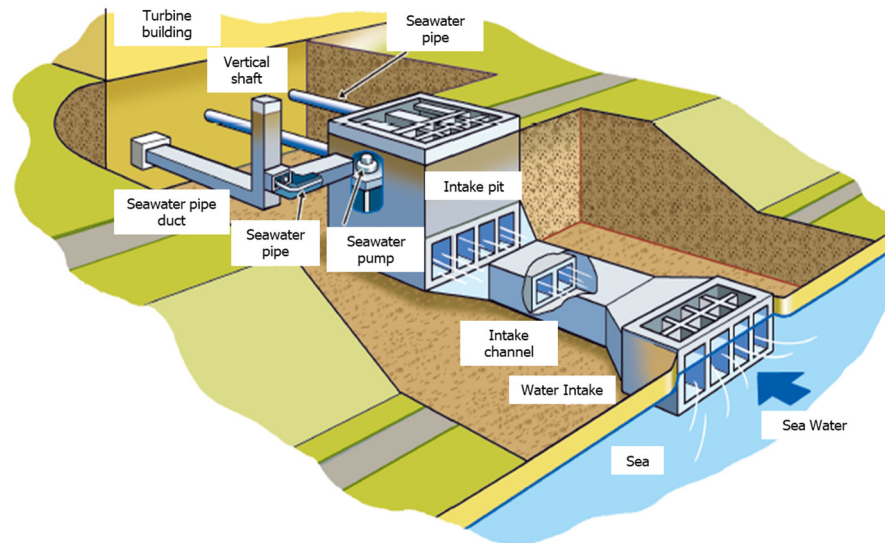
An example of underground reinforced concrete structures in nuclear power stations.
